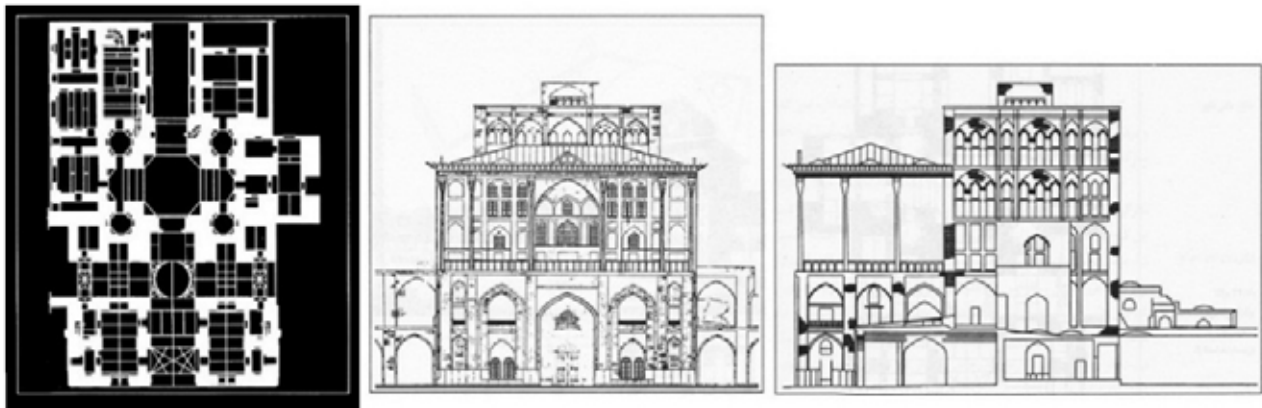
From left to right: Plane, facade and a cross-sectional view of the building of the Ali Qapu Palace. Source: Pirnia, 2008: 301-302.
